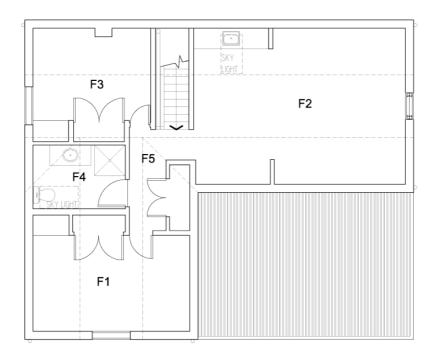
The first floor plan of the coach house, not to scale. Source: Tanner Architects 2010.
